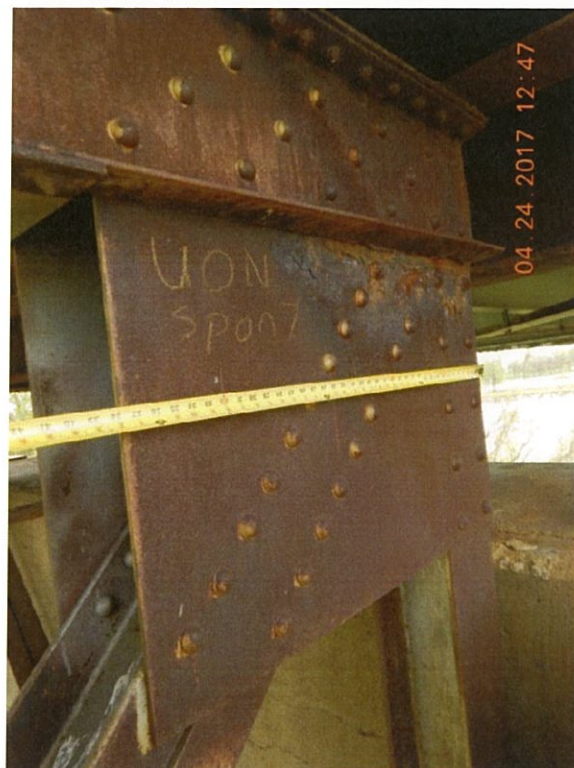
Minor packrust up to 1/4" is typical at the deck truss upper connections below the deck joints. Span 7 U0 Lt. exterior shown.
